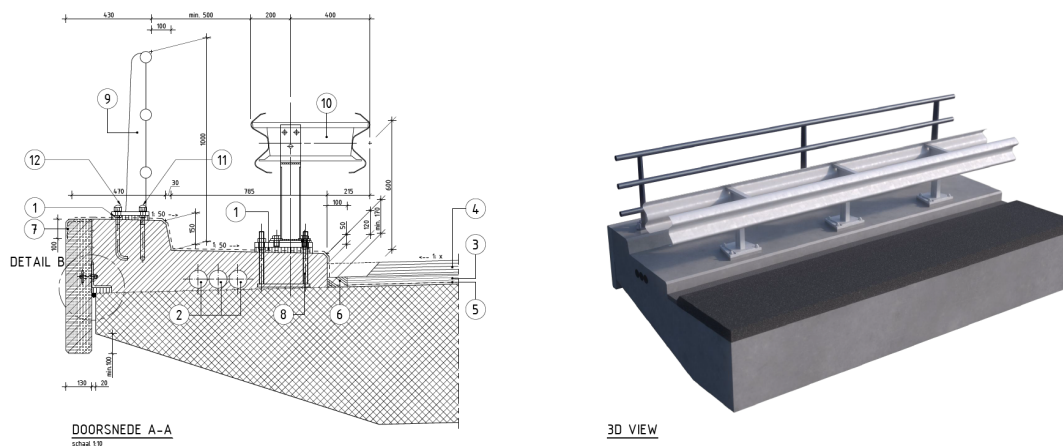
Cross-section of a standard Rijkswaterstaat kerb detail and a 3D rendering [Xlb]
